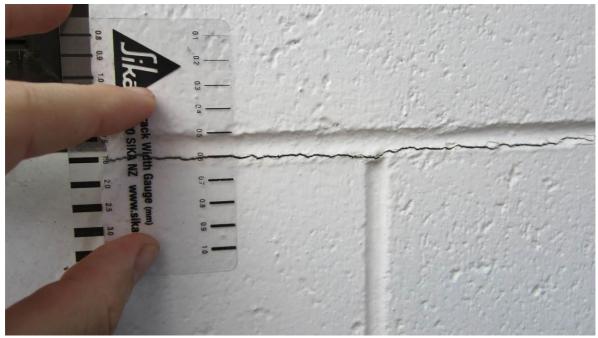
External concrete masonry block veneer of Block C.Damage Description: Cracking in concrete masonry block veneer mortar.
